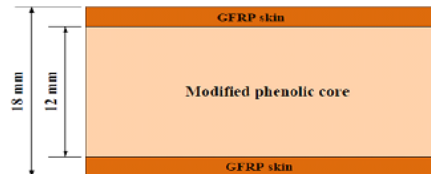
GFRP sandwich slabs cross sections (Awad et.al. 2012b)
